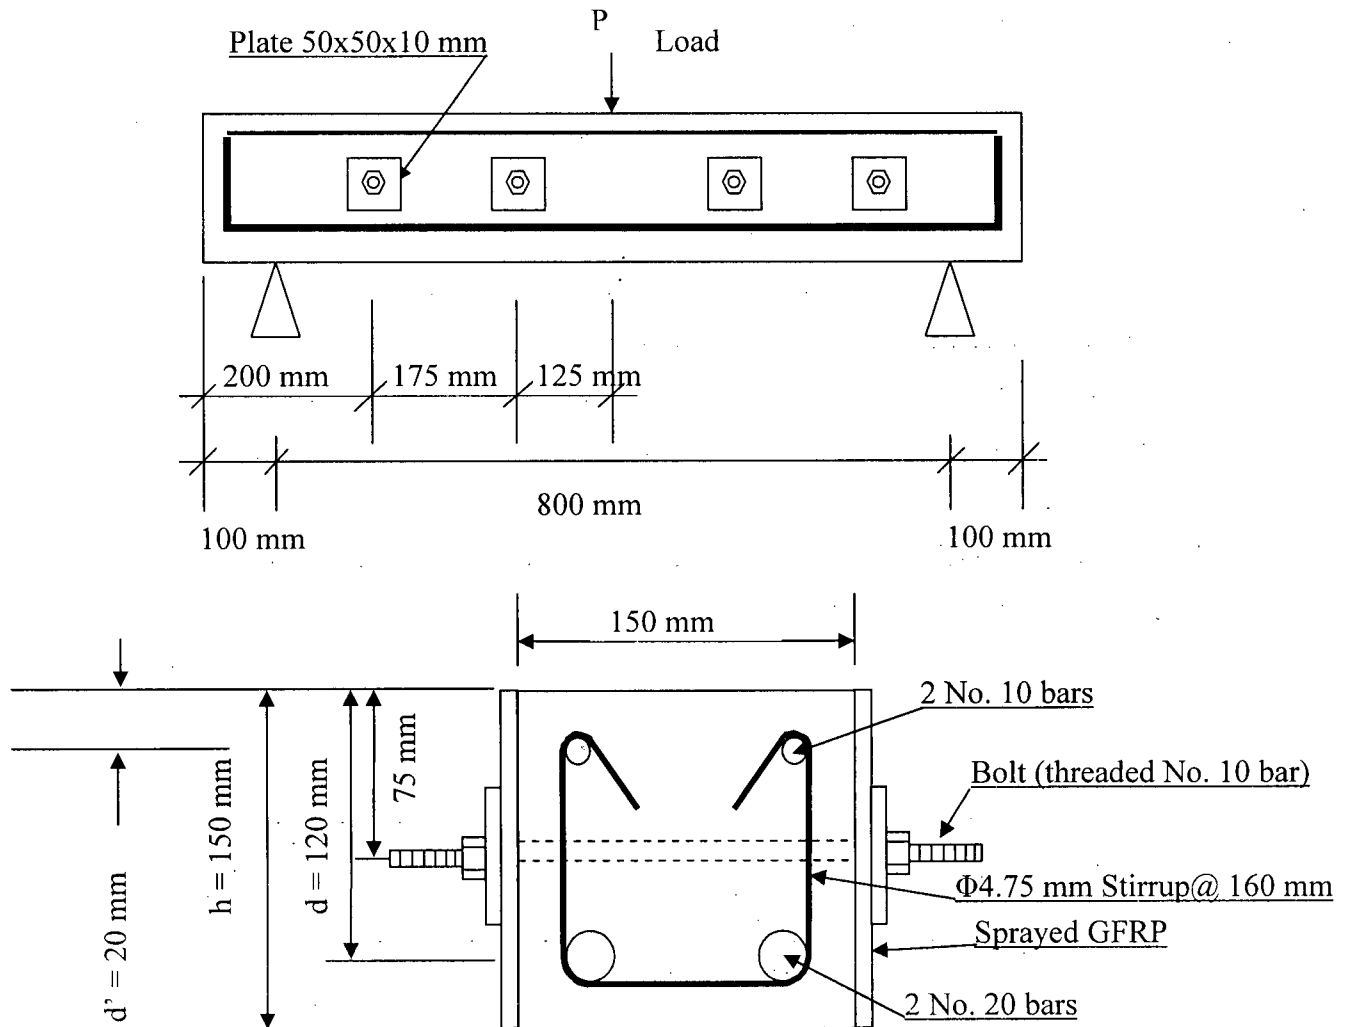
Cross-Sectional Details of RC Beams: SI-4B-800-1 to SI-4B-800-3
